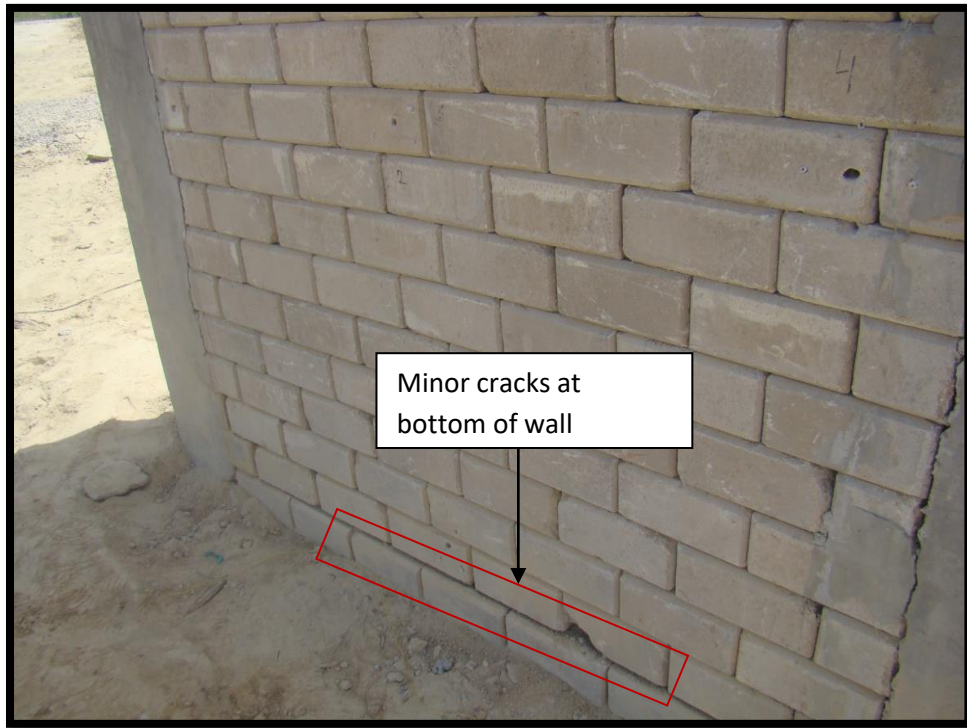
9 Minor Cracks At Wall Bottom
